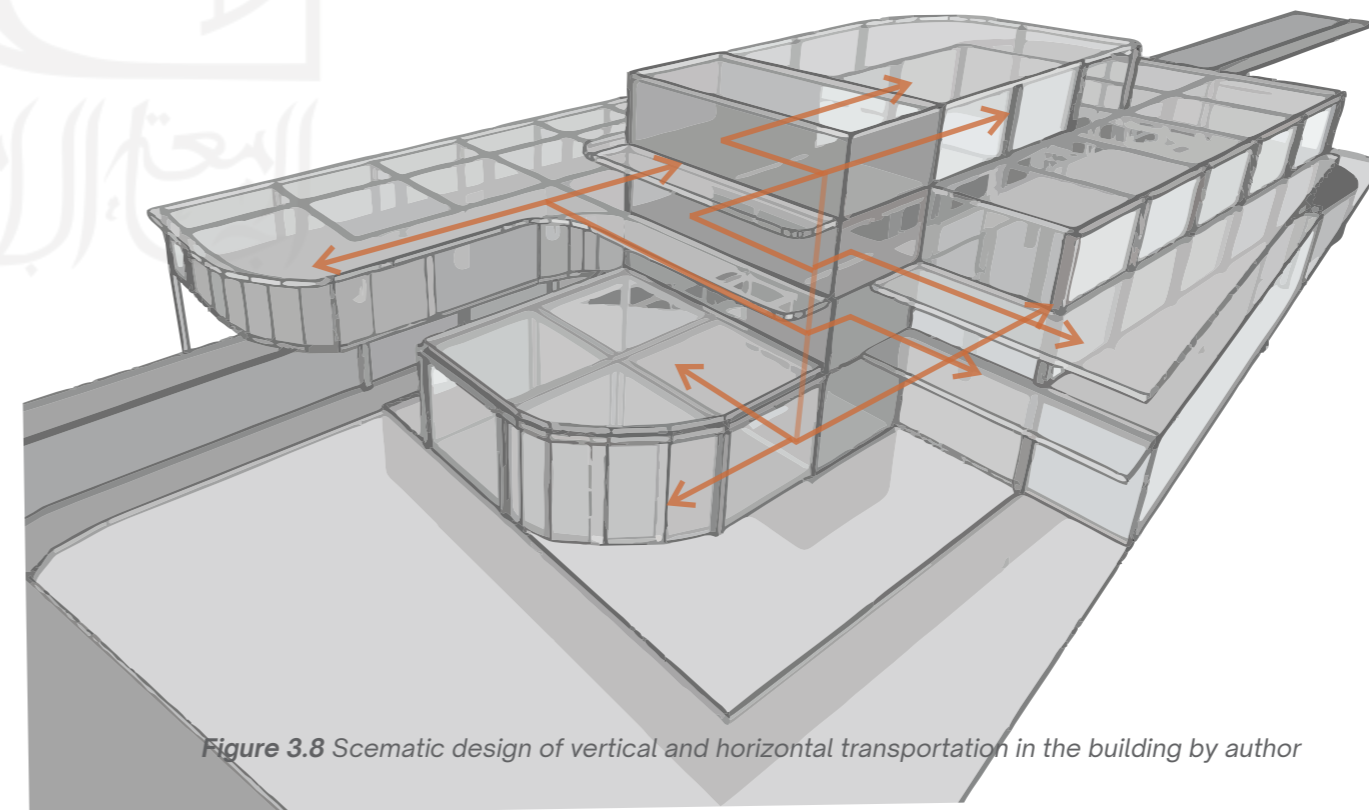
Scematic design of vertical and horizontal transportation in the building by author
